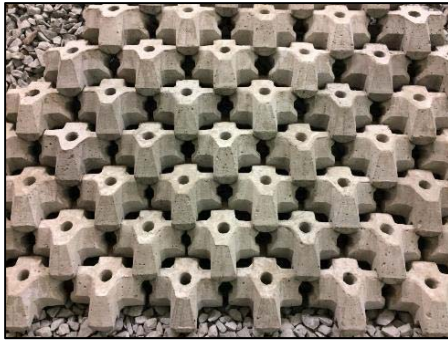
Typical X-Bloc Plus Armour Arrangement
